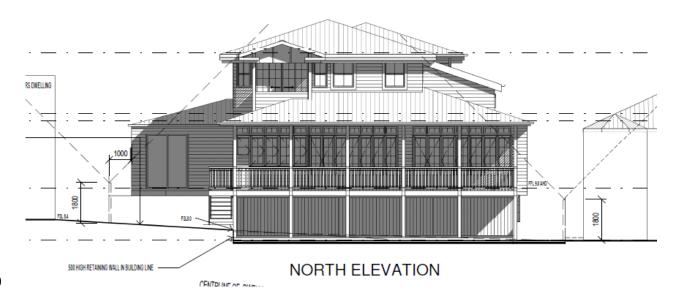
Proposed Northern elevation showing the building height plane and as existing for neighbouring properties.
